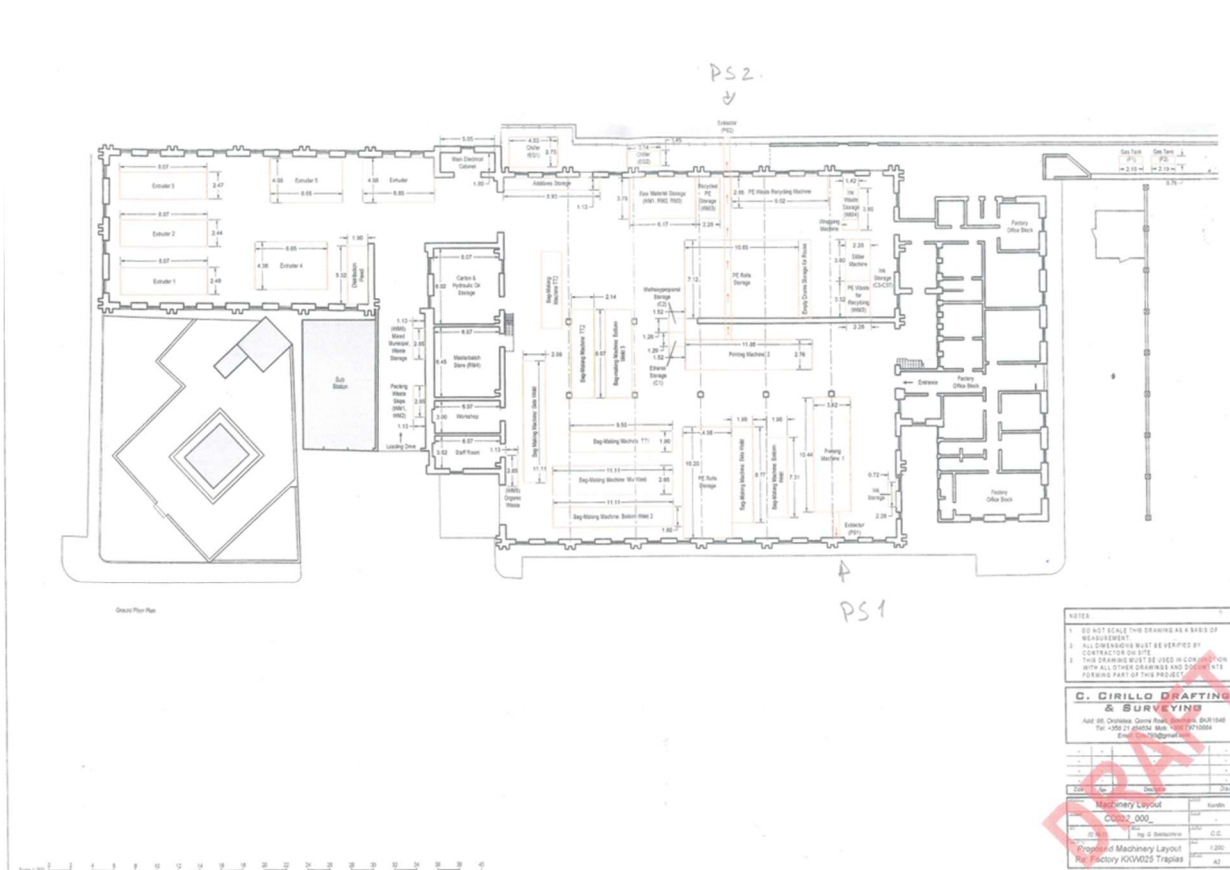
Site layout plan showing the location of emission points to air. The location points are indicative and shall not be used for interpretation purposes.
